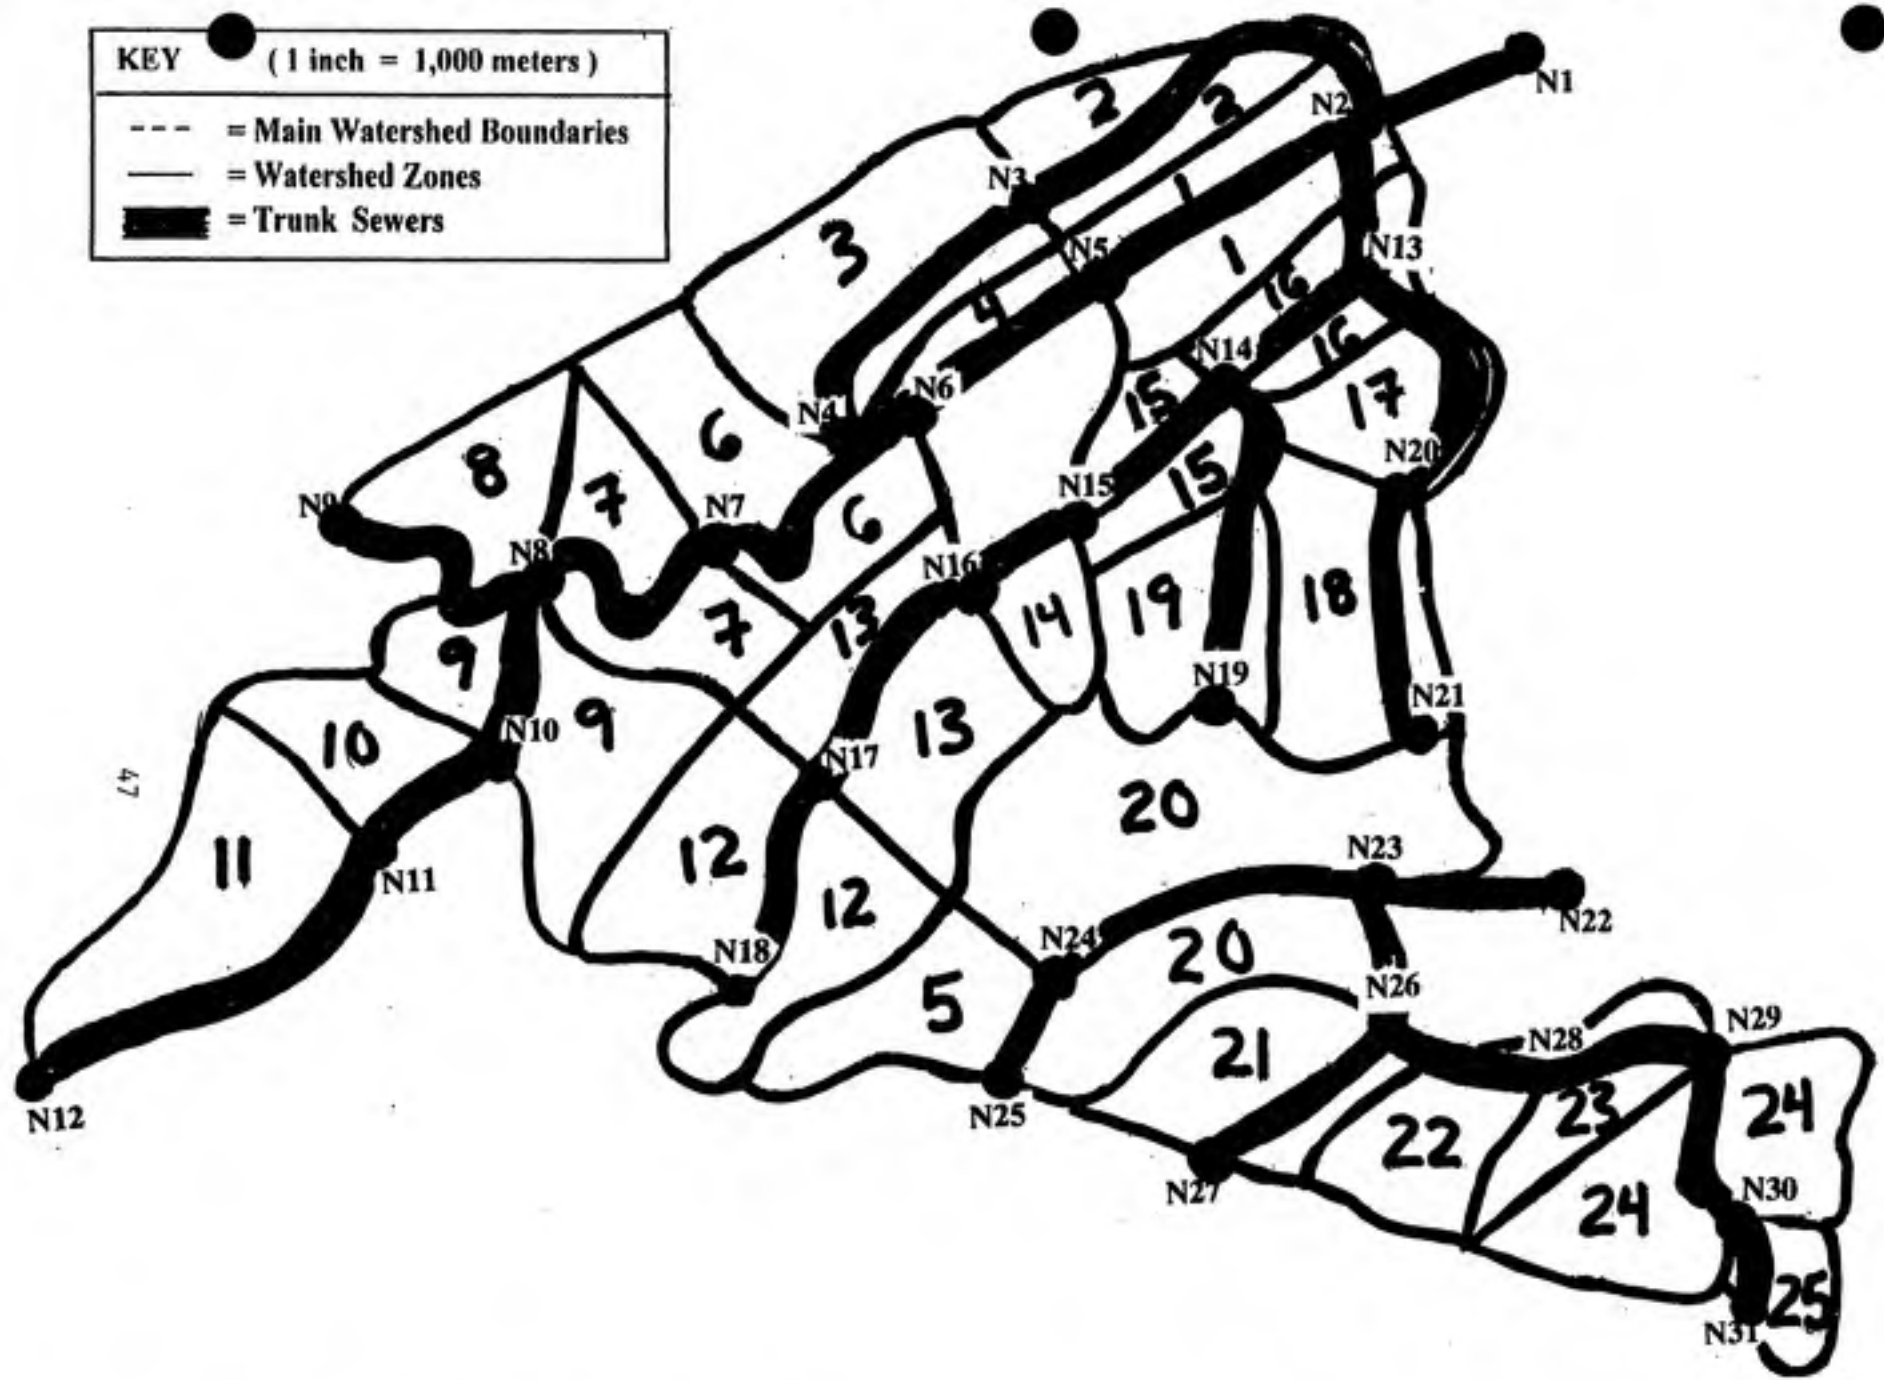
Trunk Sewer Layout and Watershed Zones
